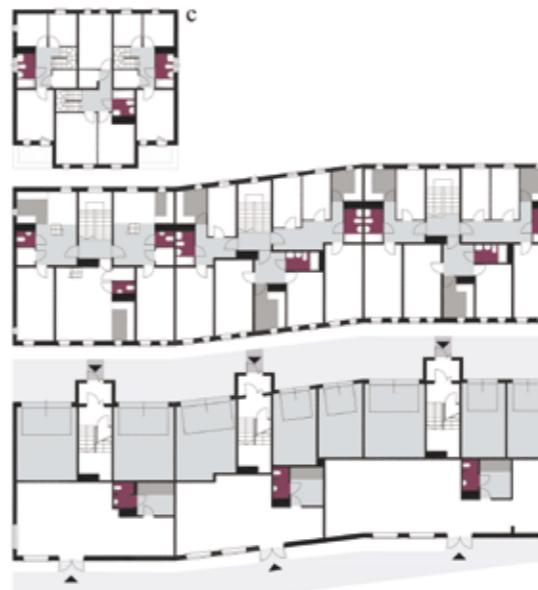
Floor plans, a) ground floor, b) third floor, c) fourth floor
